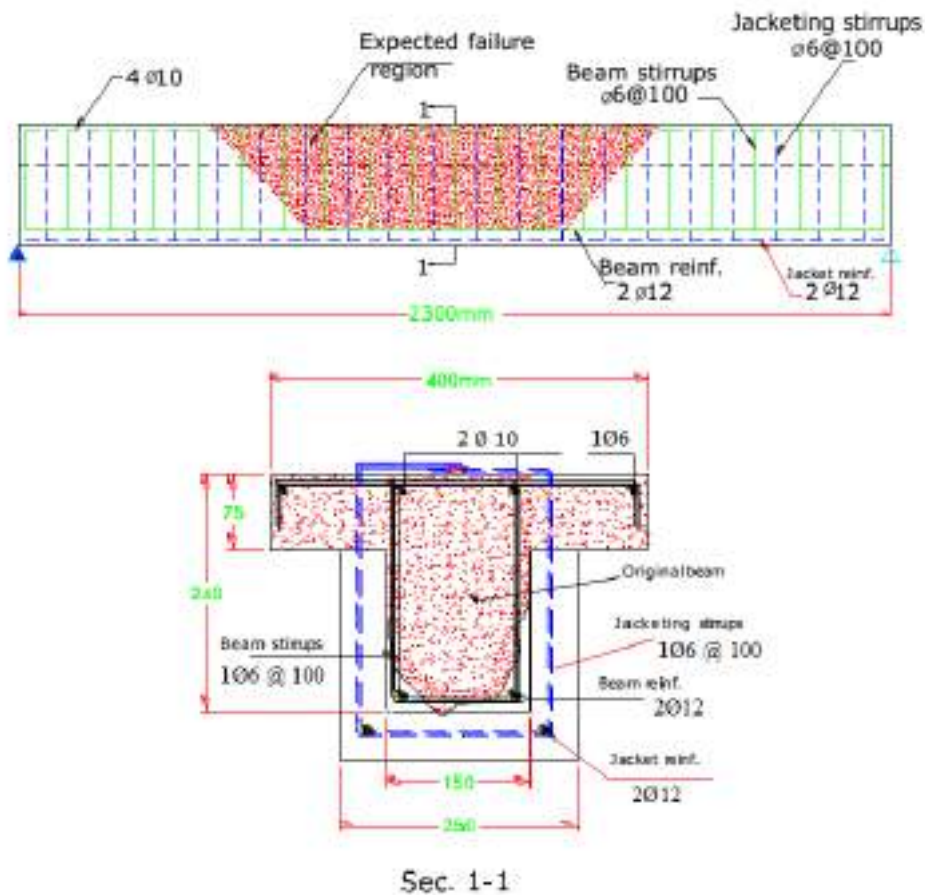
Typical jacketing of test beams (Source: AL-Kuaity, 2010).
